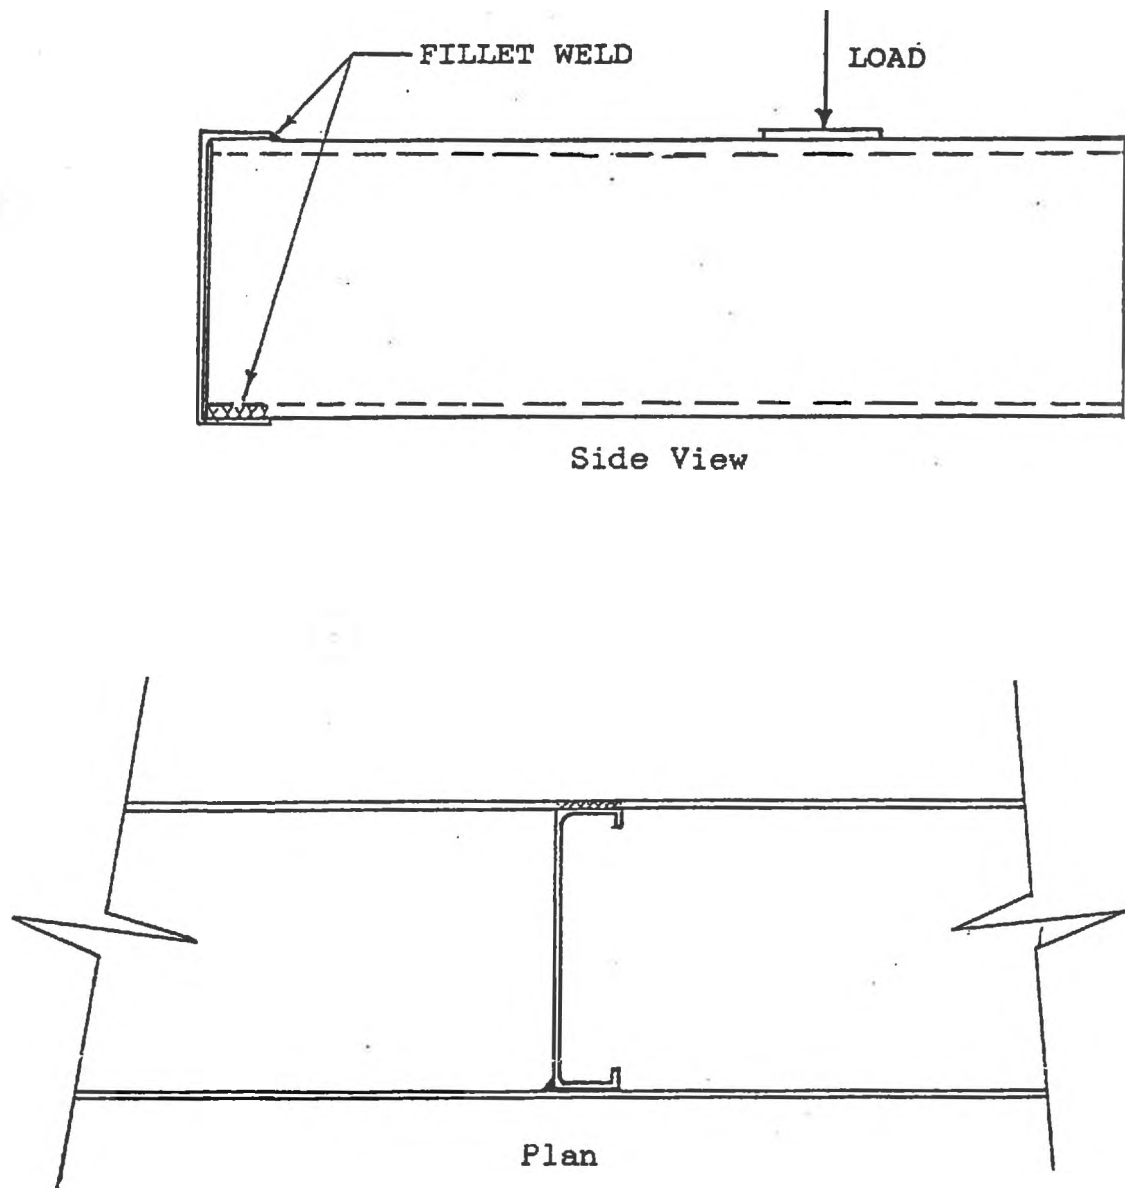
Typical Welded Stud to Track Connection Detail Used for Series D13
